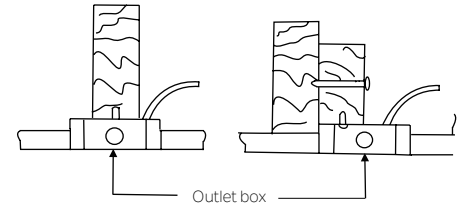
, 2 and 3 are examples of different ways to mount the outlet box.
